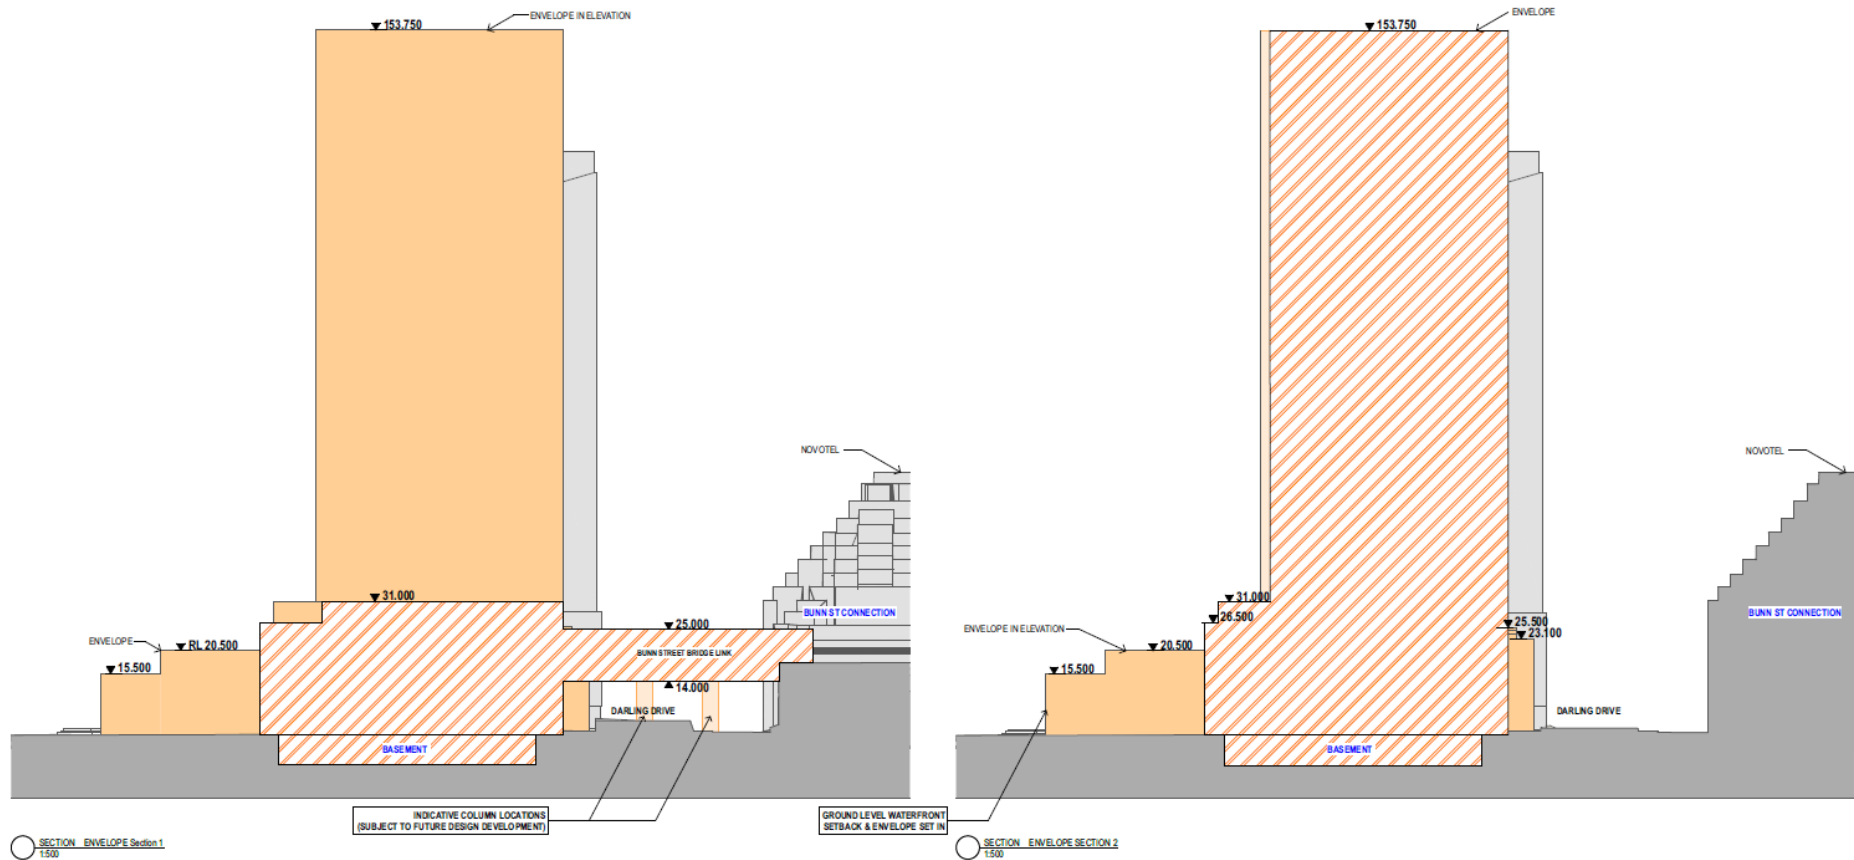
Envelope Cross Sections (Source: FJMT, 2020)
